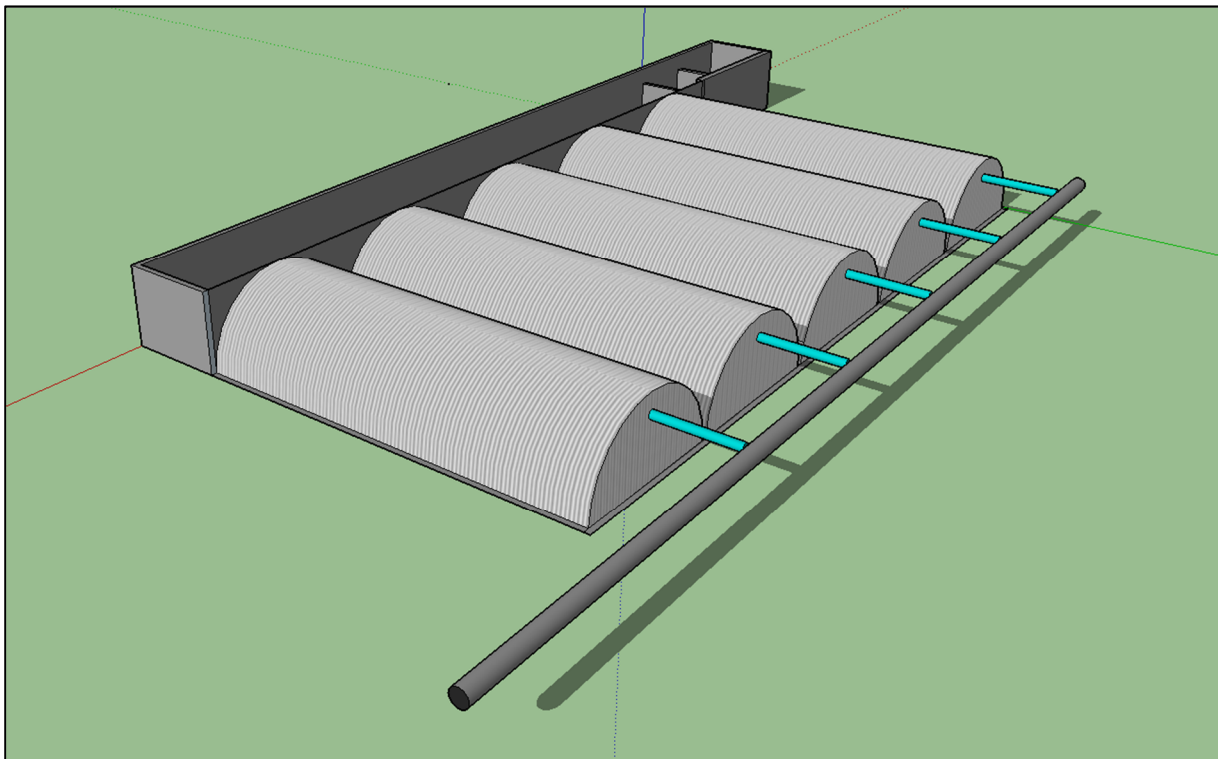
Steel detention tanks, PVC outlet pipes connecting into reinforced concrete pipe.
